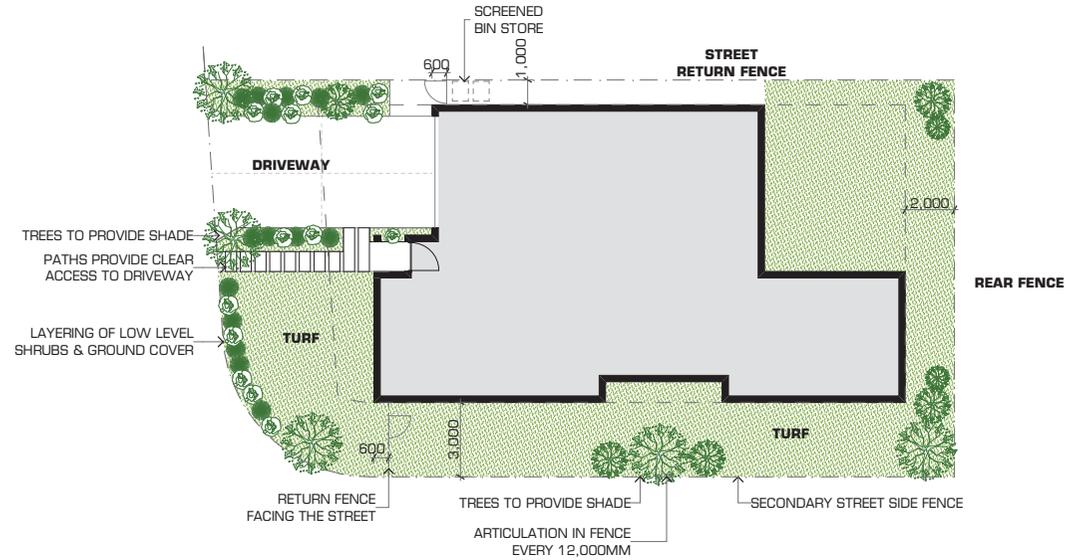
Typical Frontage Landscape for Corner Lots - Option 1
